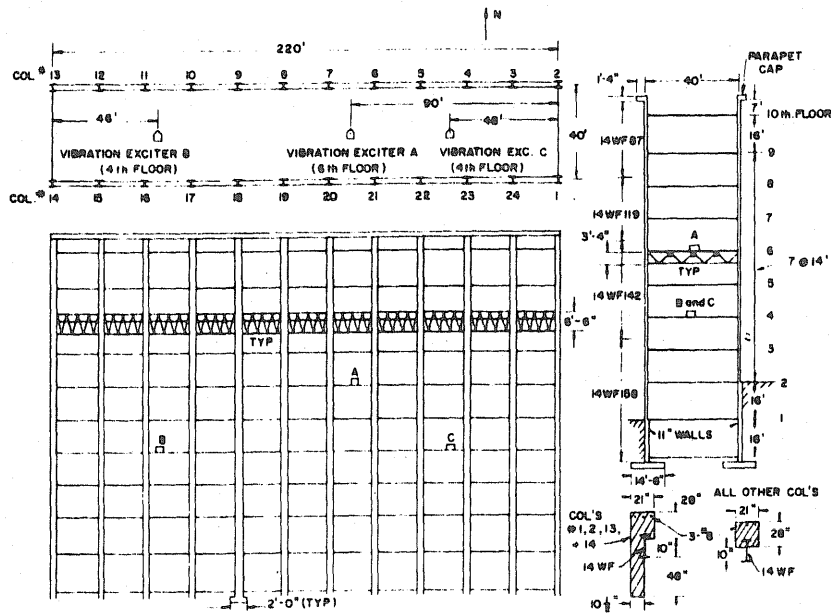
PLAN AND ELEVATION OF 10 STORY BUILDING (AFTER NIELSEN [1968])
